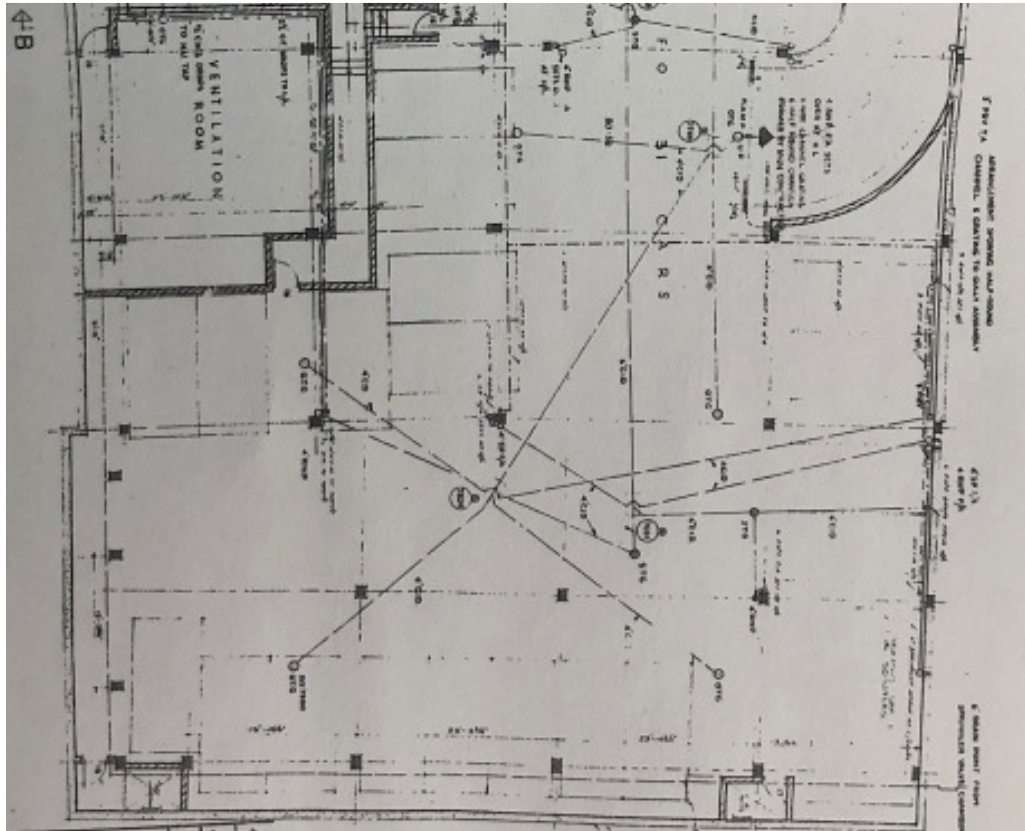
Extract of 1963 Basement Floor Plan (albeit part of larger proposed extension and redevelopment scheme)
